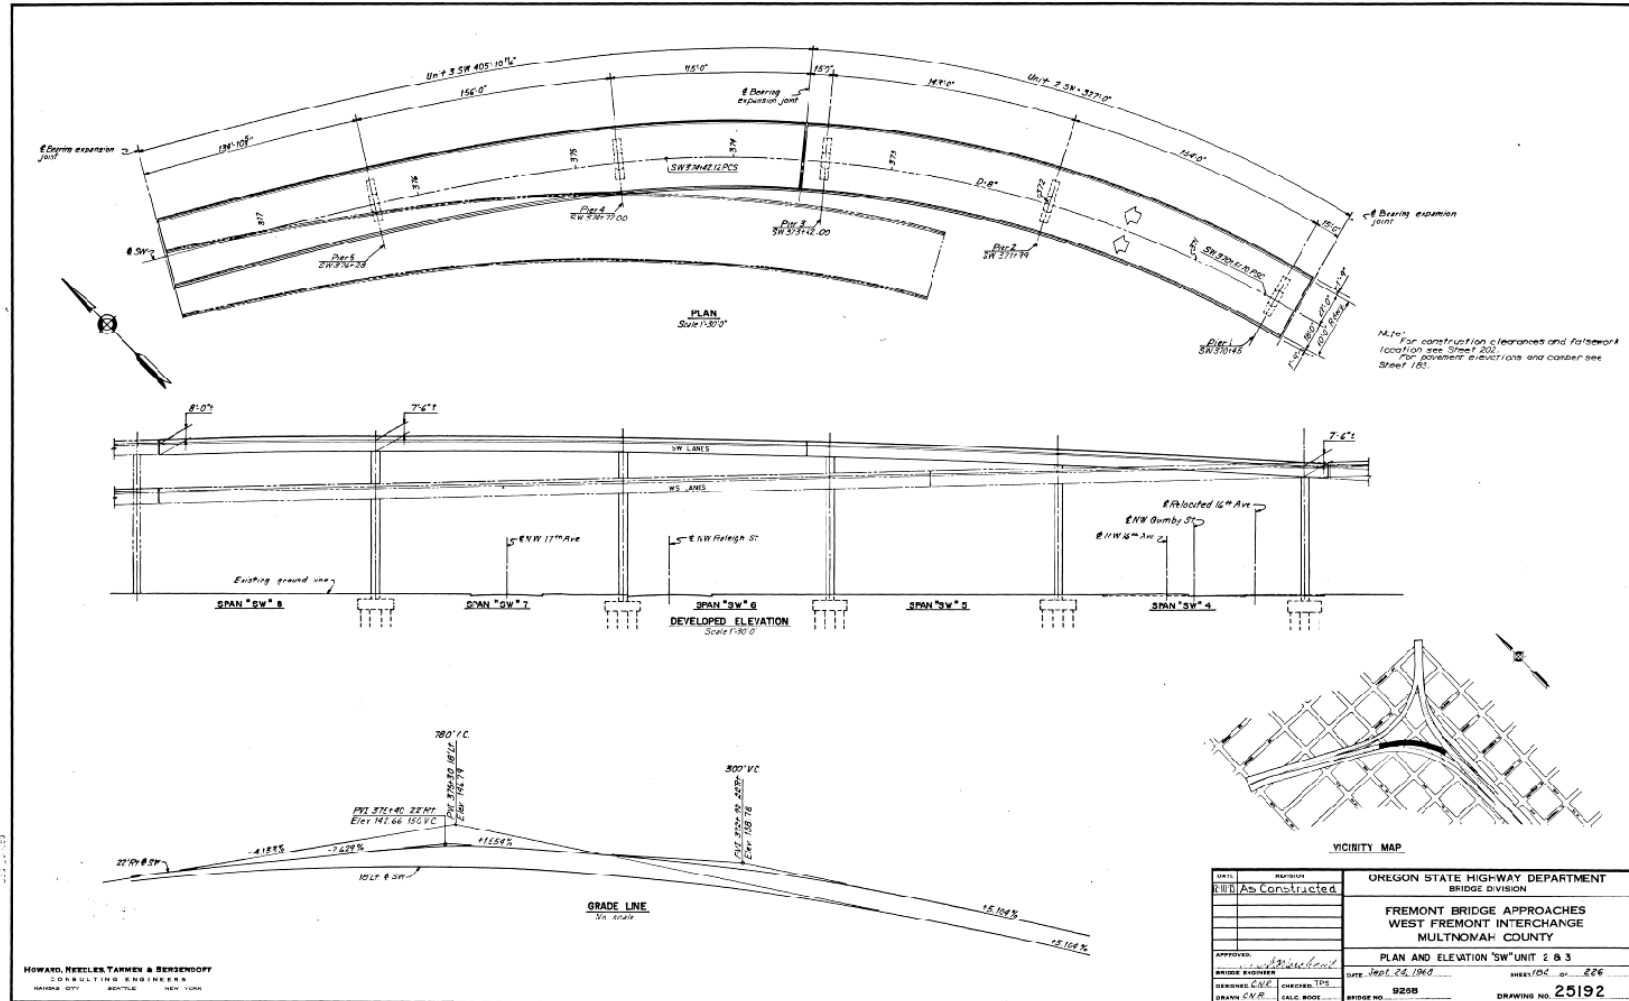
Plan and elevation views of SW Unit 2 and 3 Bridge superstructure 09268A.
